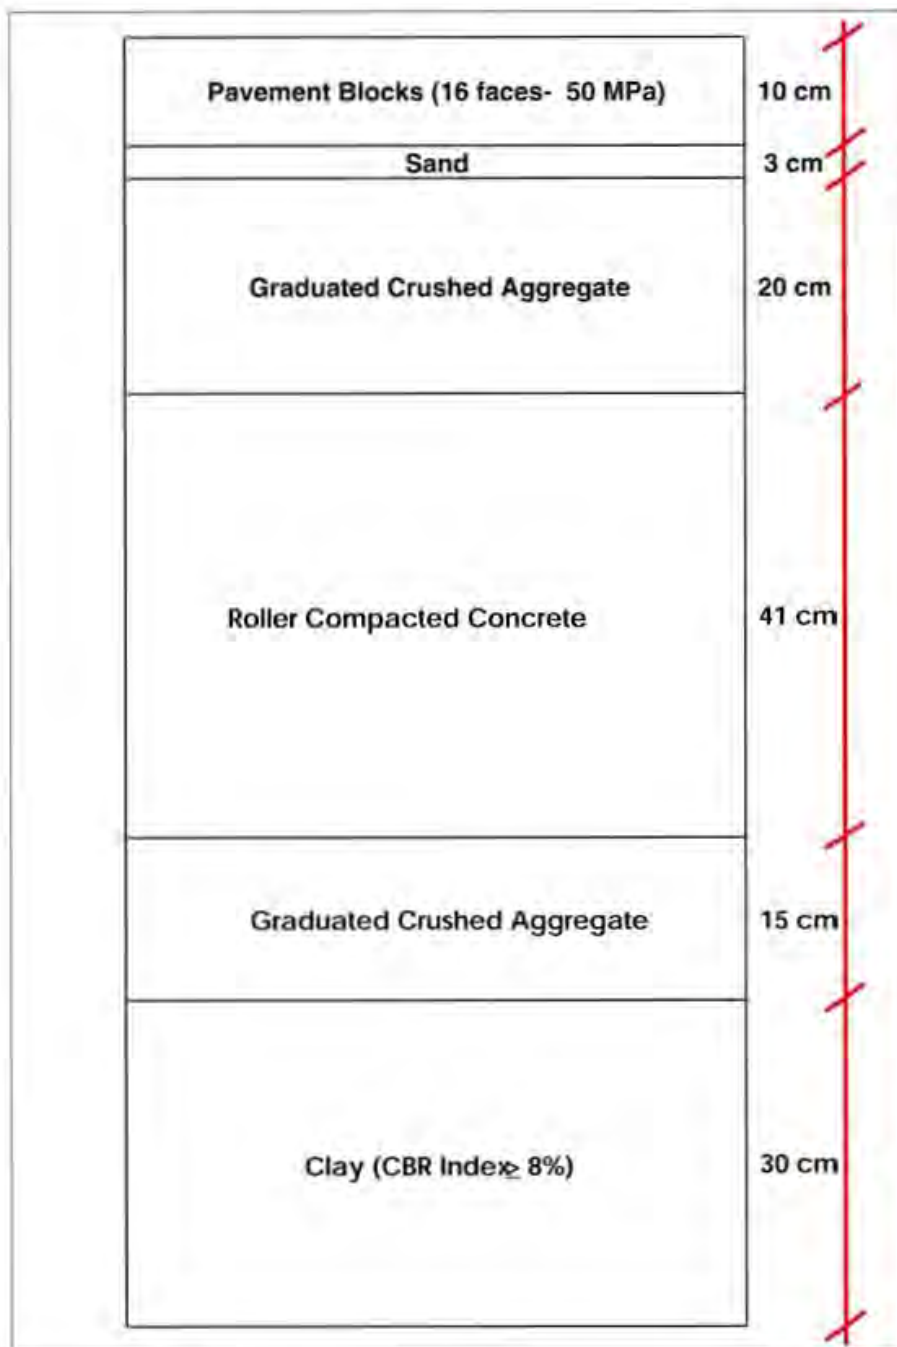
Structural detail of the pavement for the Sepetiba Terminal, Rio de Janeiro, Brazil. (Courtesy; Carlos Yukio Suzuki-Planservi Engenharia Ltda.)
